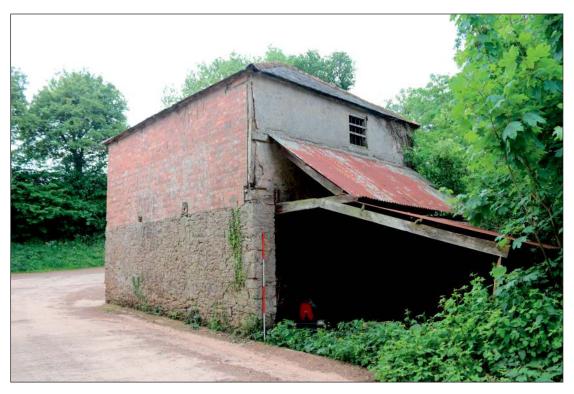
The east and north elevations looking southwest, showing the replacement brick masonry and the original plastered timber frame as well as the northern extensions (2m scale)
